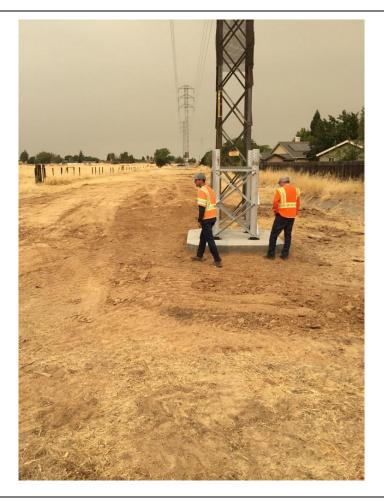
Completed foundation at Bogue Sub-Line Segment Pole 0/4.
